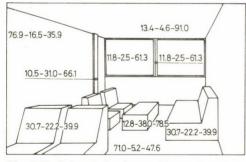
Colour design for smoking and rest room (in a machine tool factory)
